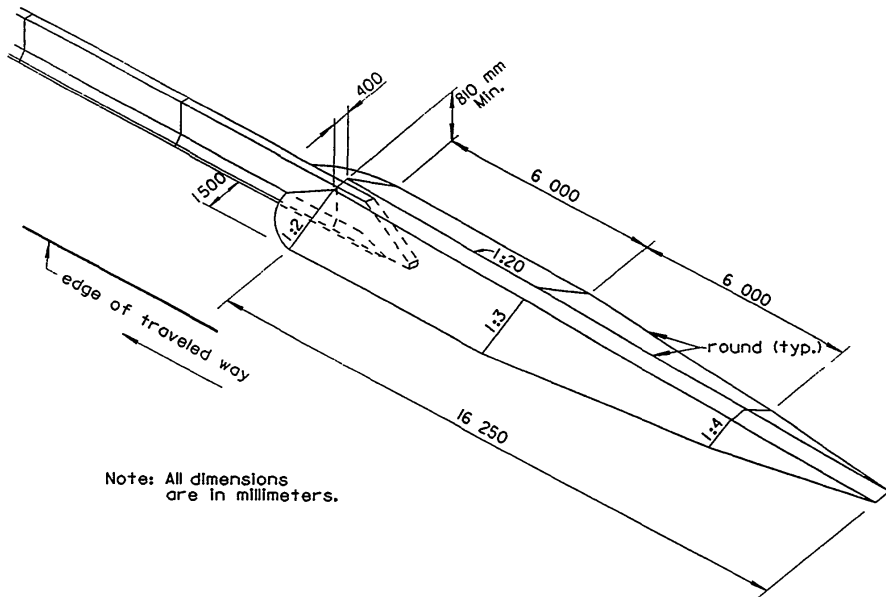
Typical Earth Berm Barrier End Treatment
